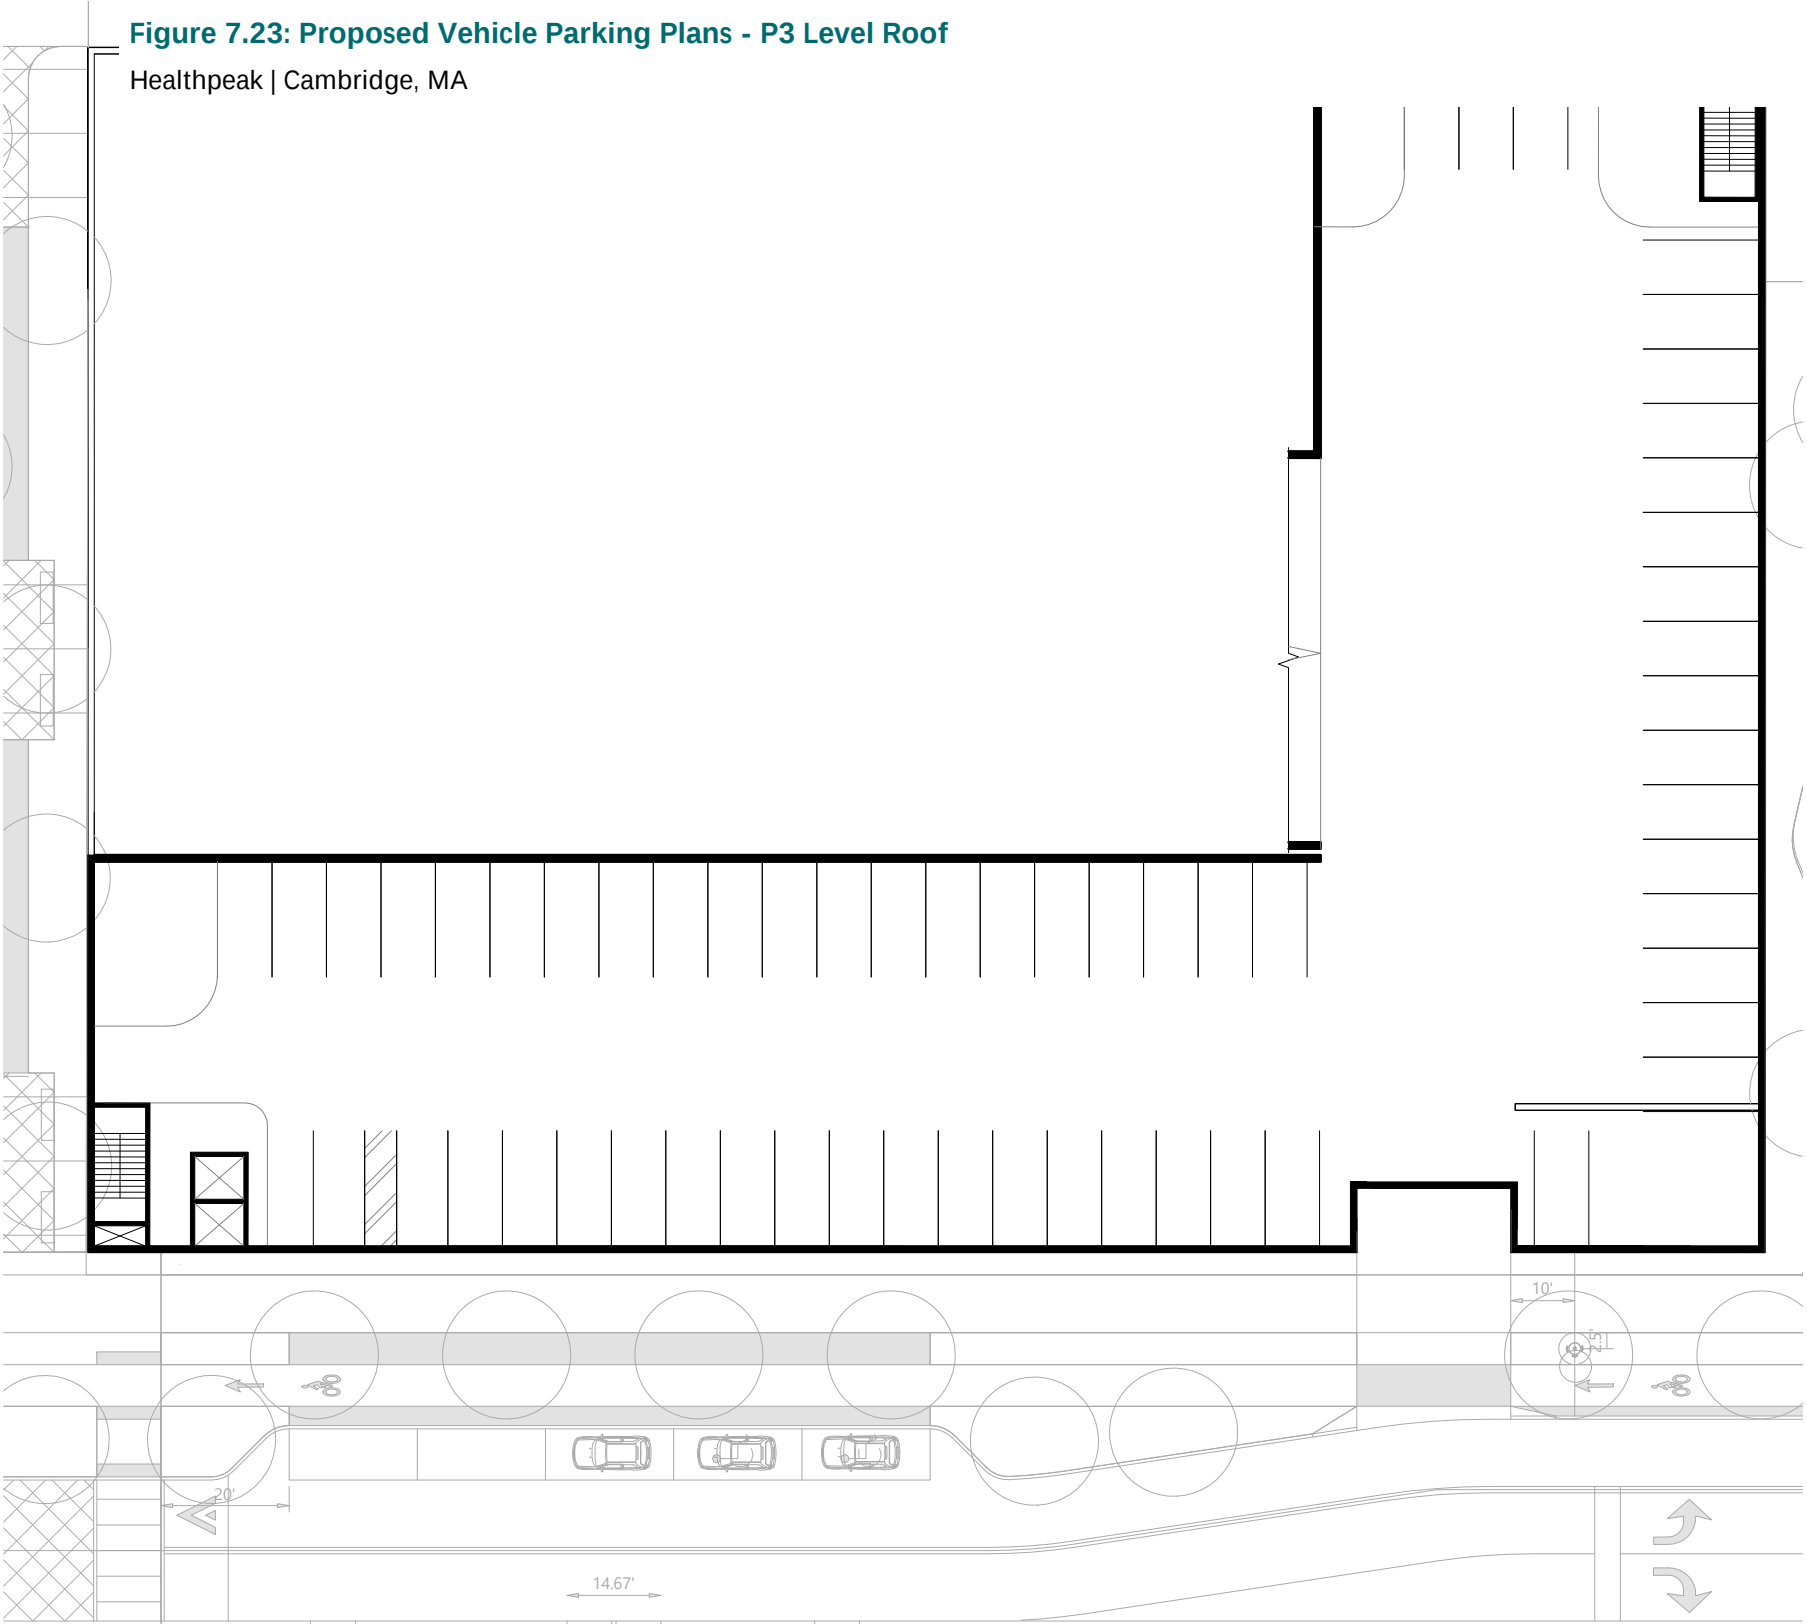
Proposed Vehicle Parking Plans - P3 Level Roof
